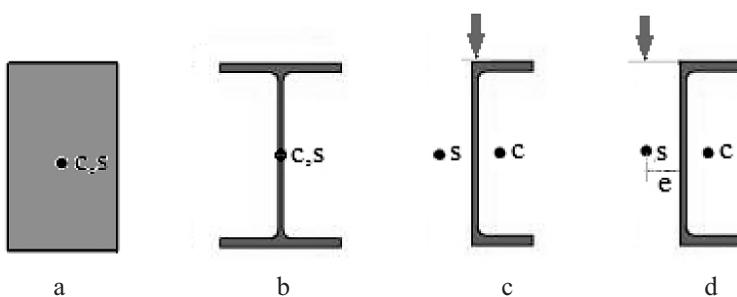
Cross section: (a) solid, (b) double symmetric, (c) eccentrically loaded, and (d) centrally loaded.
